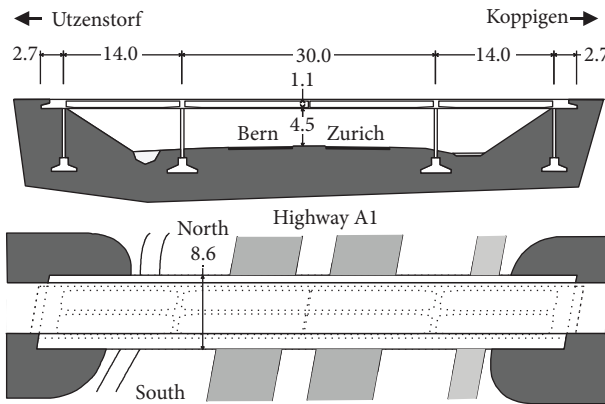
Z24 bridge: longitudinal section and plan view.
